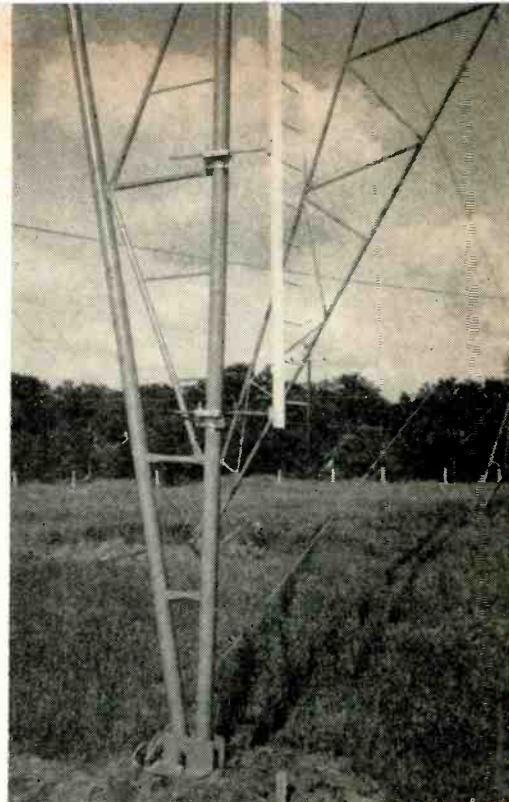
Closeup of A-frame structure showing leg anchored to concrete base.
